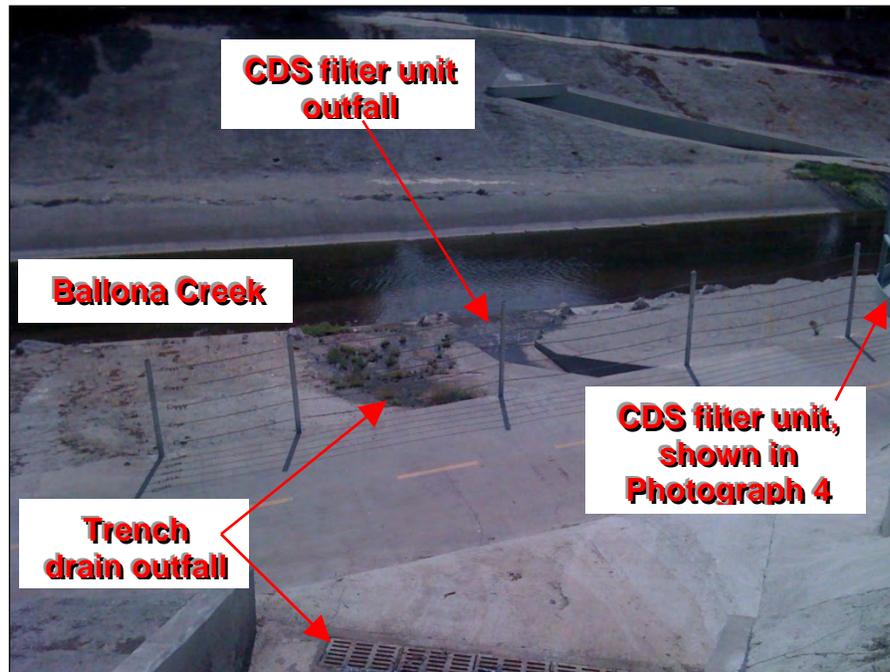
View facing southwest at rain garden installed adjacent to Ballona Creek.
